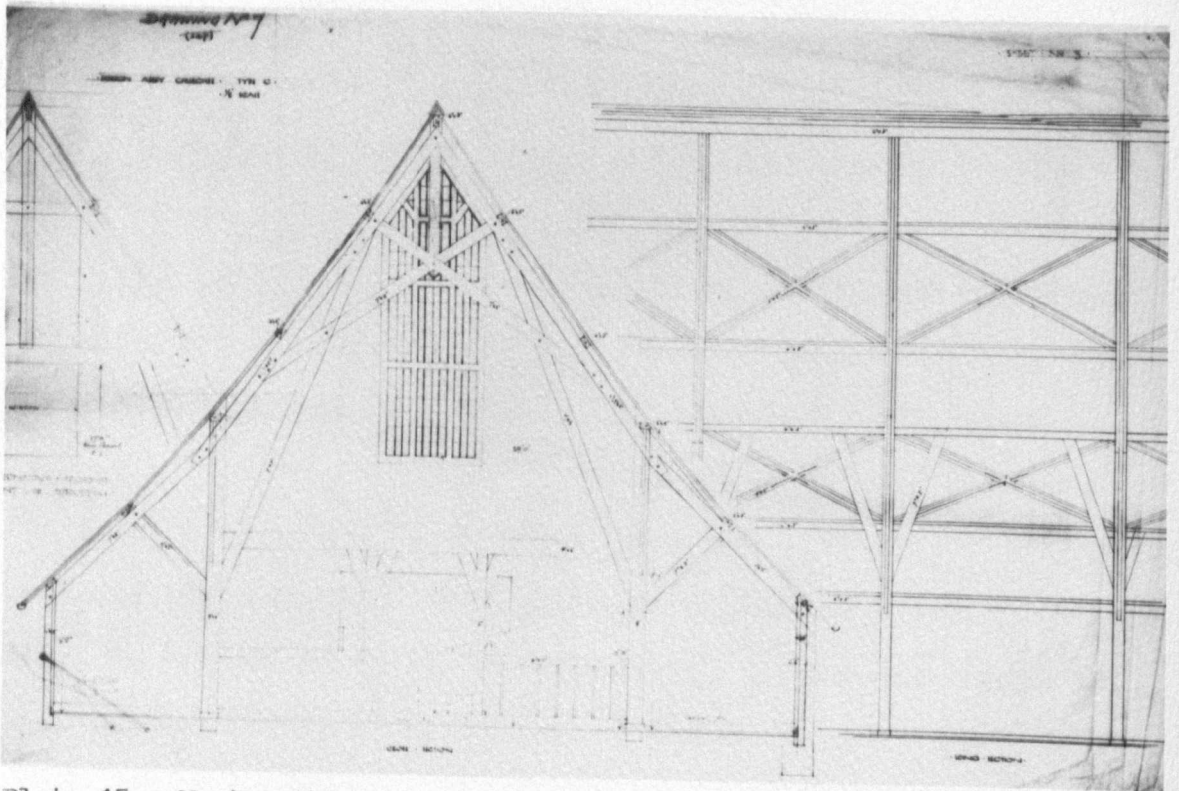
Merton Abbey church Type C, cross and long sections. Original to 1/8" scale.
